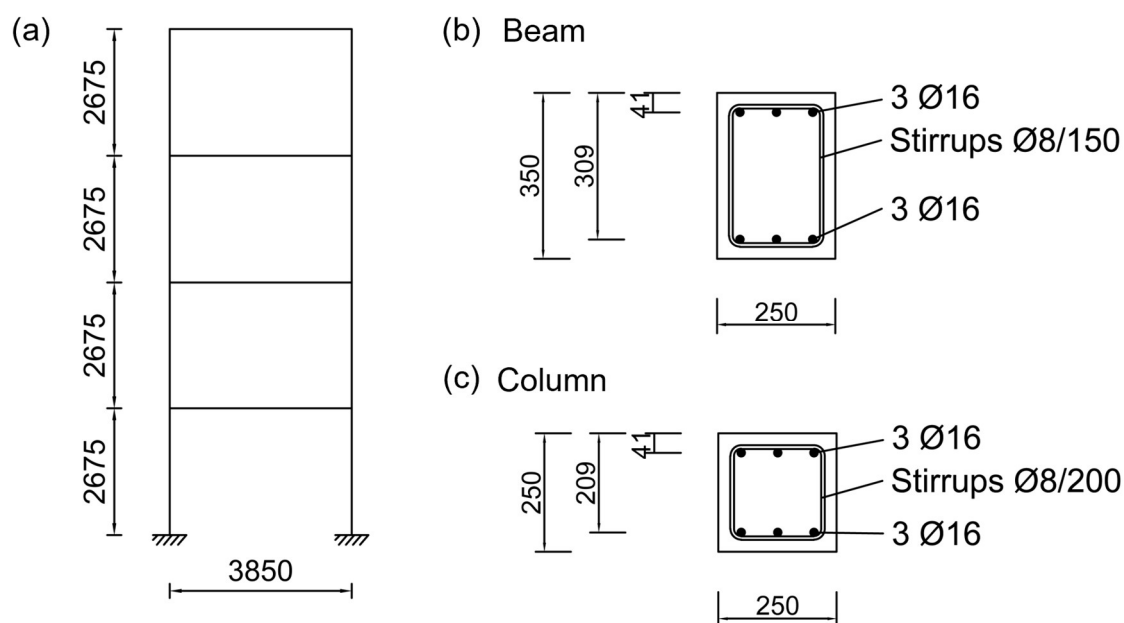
Description of the original structure. (a) Line diagram, (b) beam section properties, and (c) column section properties. (Note: All dimensions are in mm).
